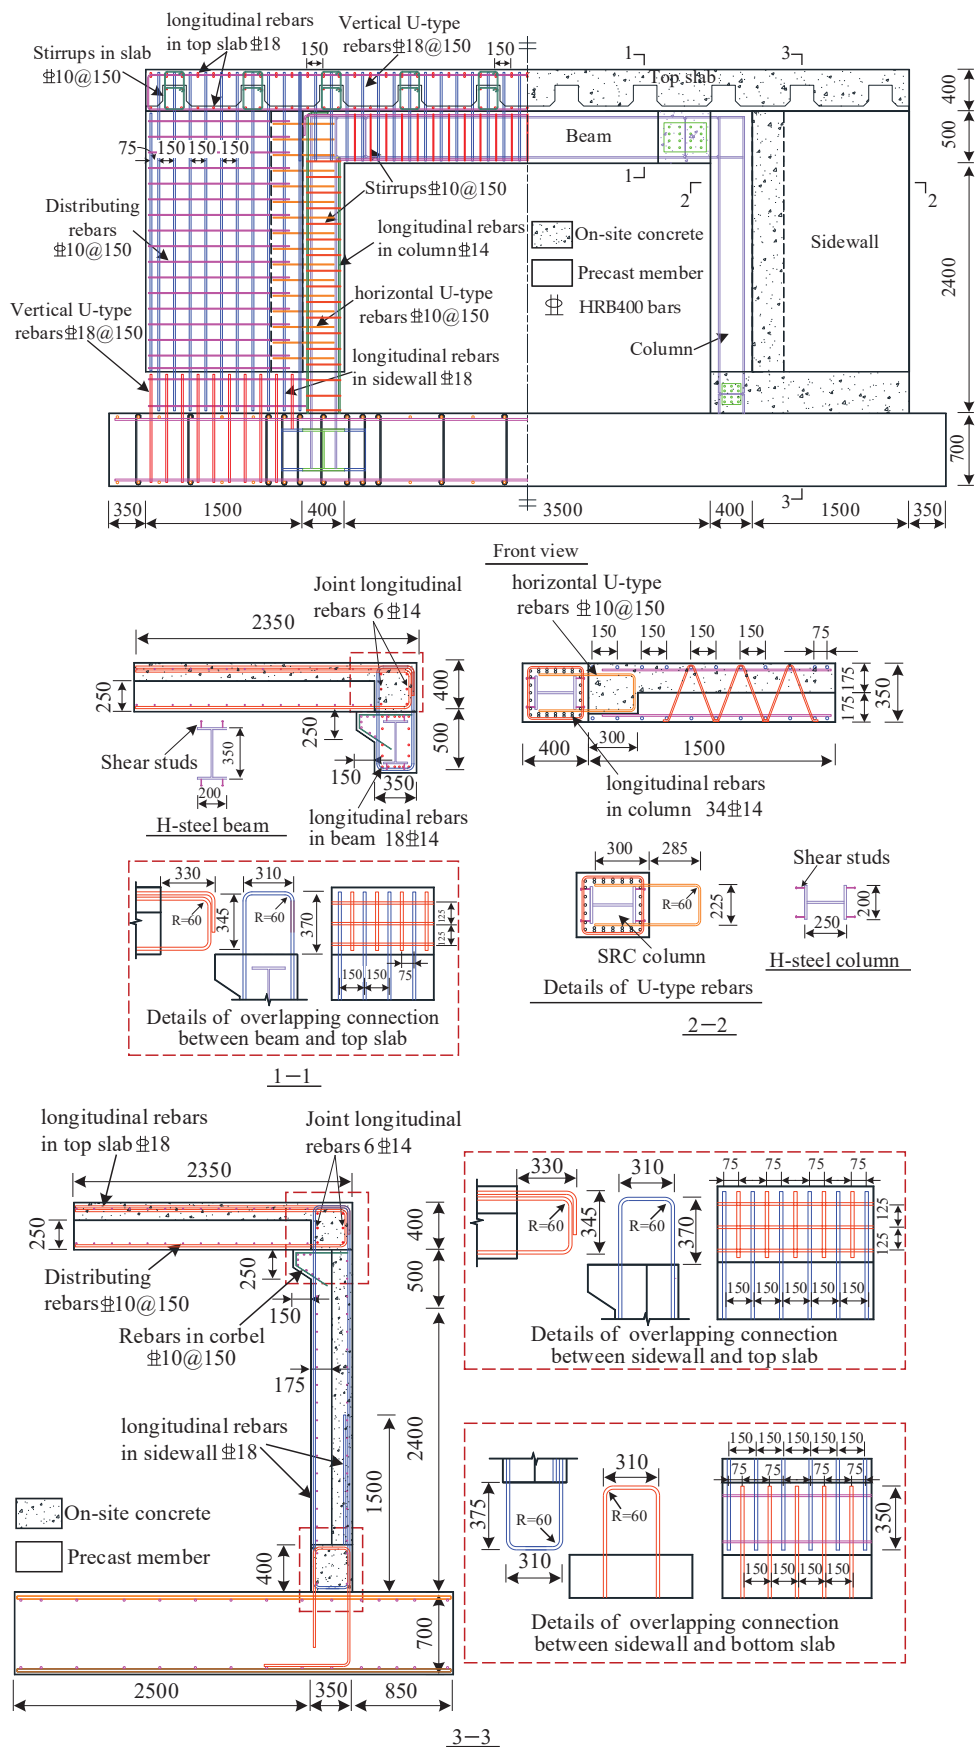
Dimensions and reinforcement details of the test specimen (units: mm).
